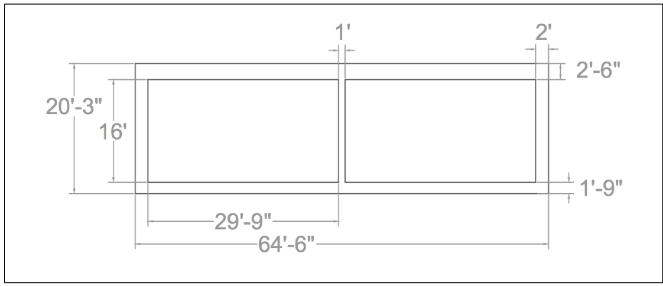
Tunnel Cross-Section – Reduced Dimensions
